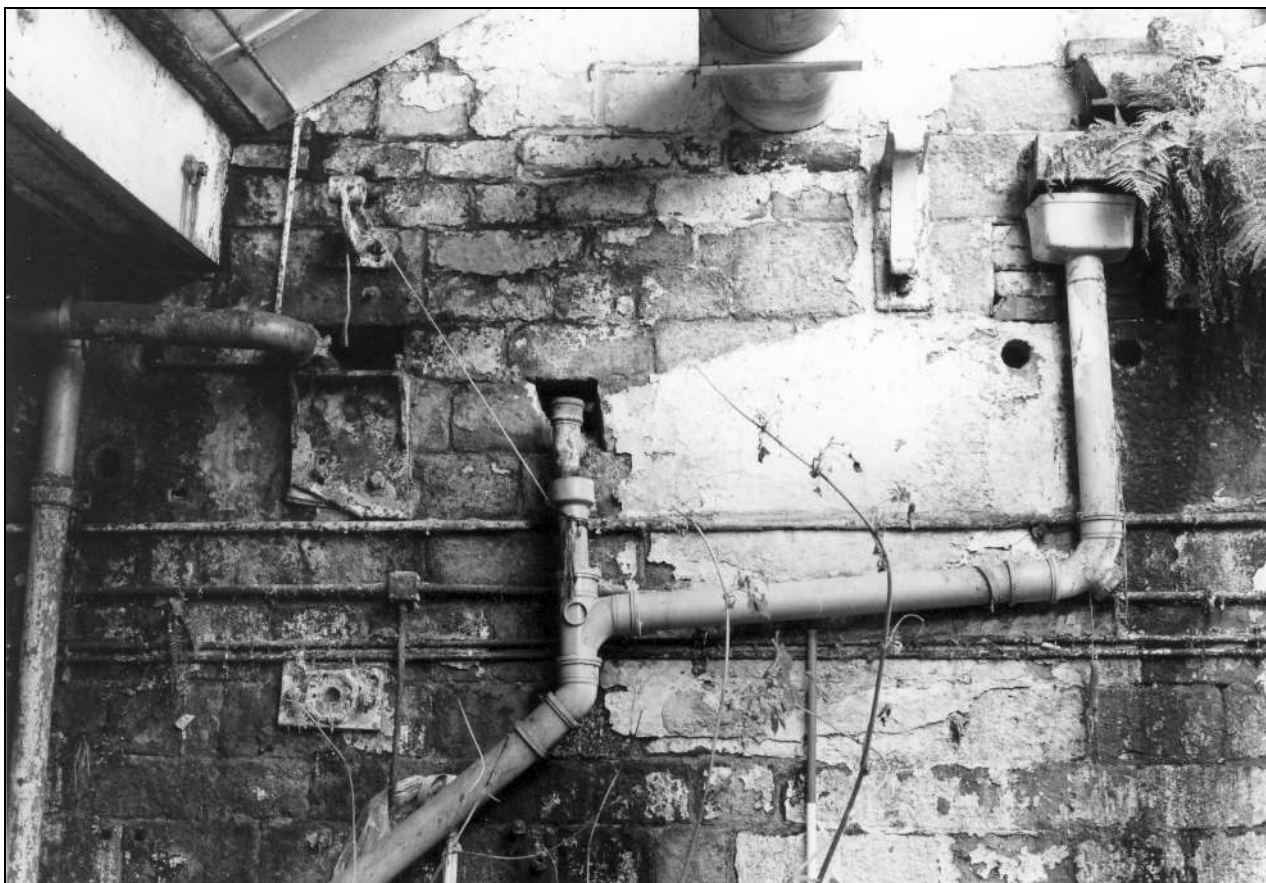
Detail of line shaft brackets etc in east elevation of weaving shed (film 2, frame 4)
